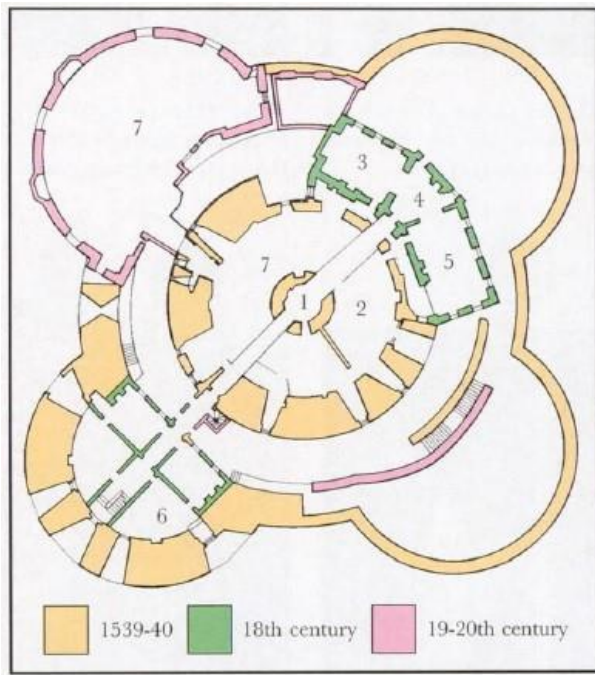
First-floor plan of Walmer Castle and how these rooms have developed. Hall, H., 'Walmer Castle', *Country Life*, Country Life Archive Apr 13, 1995; 189, 15; 52.
